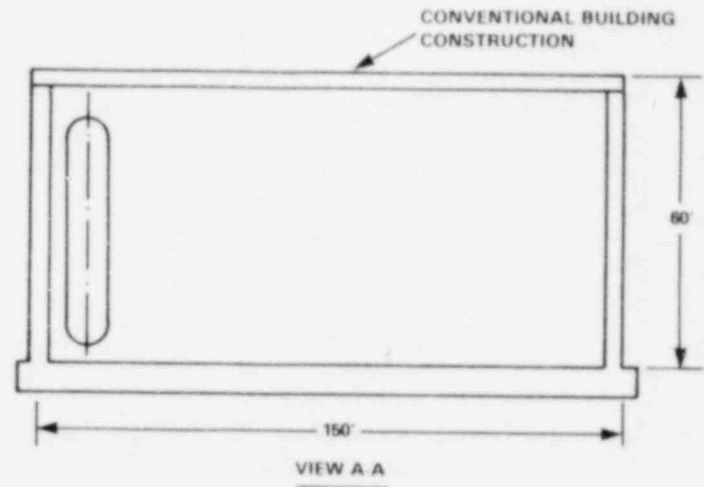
Conceptual Layout - Charcoal Storage Arrangement
